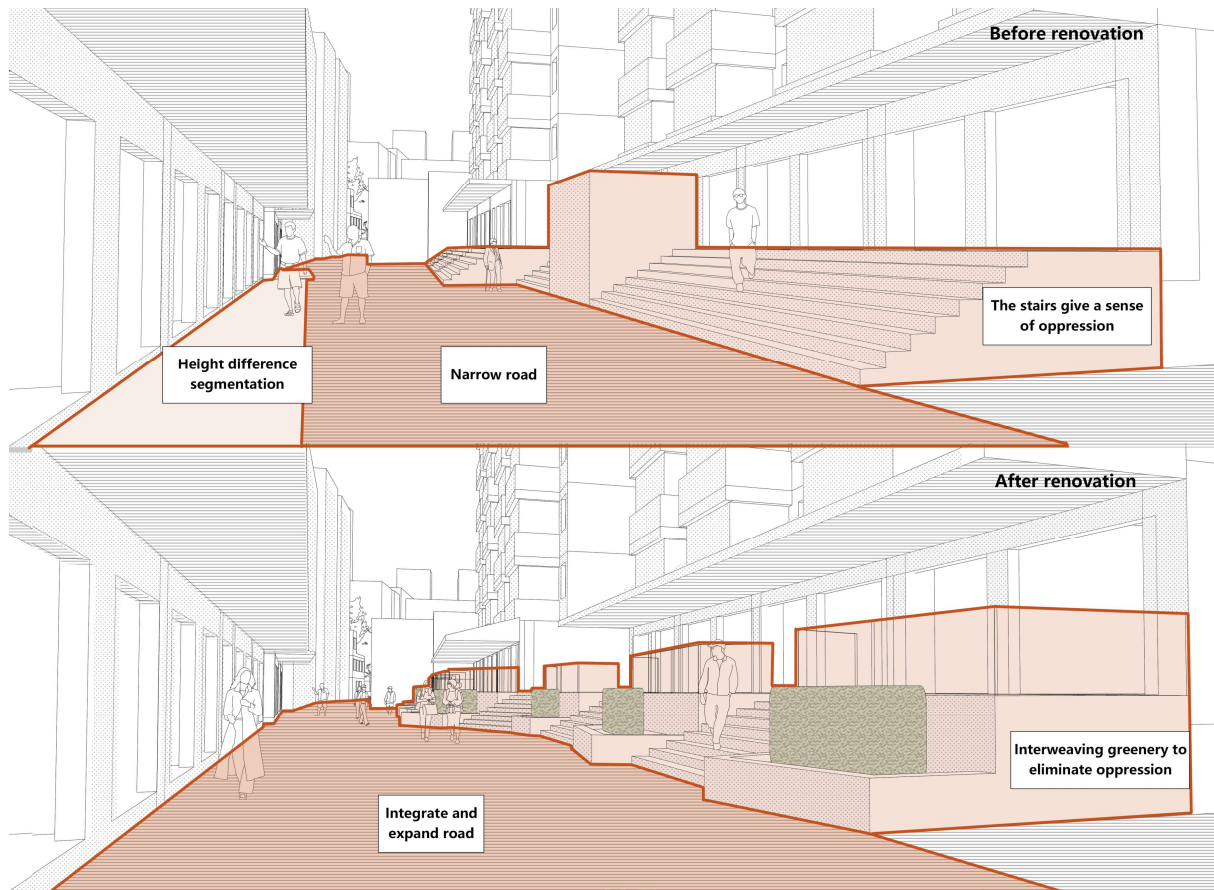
Street Node 3 Pre - and Post Renovation Renderings
